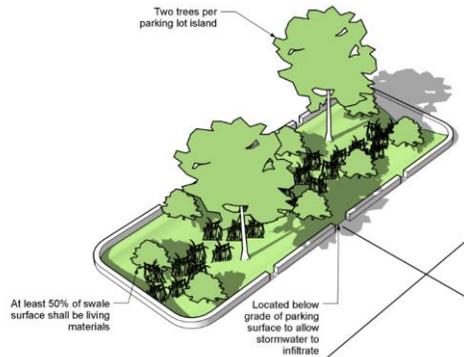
Parking Lot Stormwater Treatment Design
